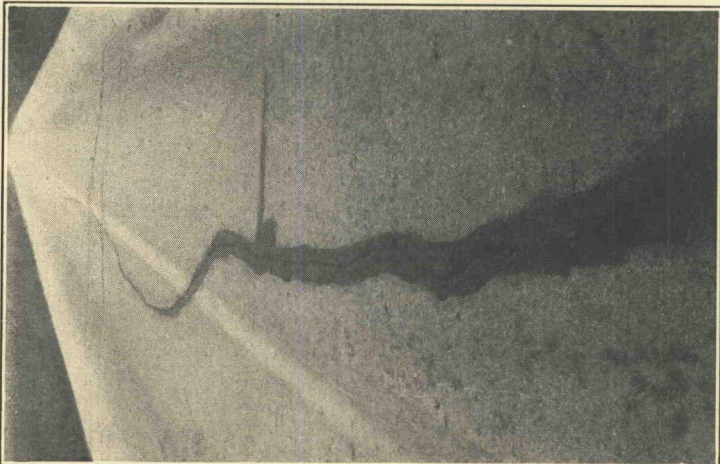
Crack in reinforced concrete road, Milwaukee Co., Wis.
